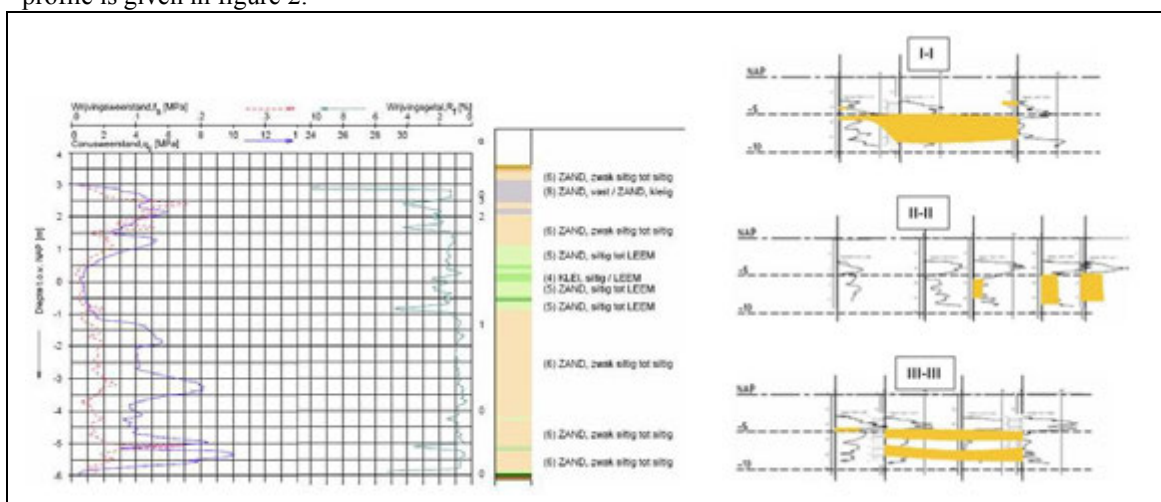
CPT, the soil profile and cross-sections I-I, II-II, III-III at the centre pillar
